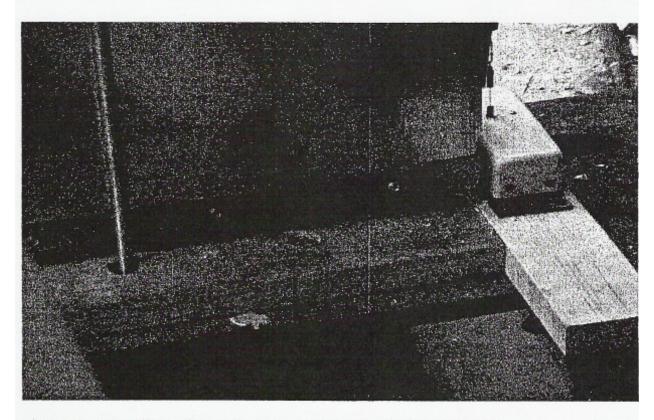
Failure of 8' Galv.-Galv. Panel Under Racking Loading
